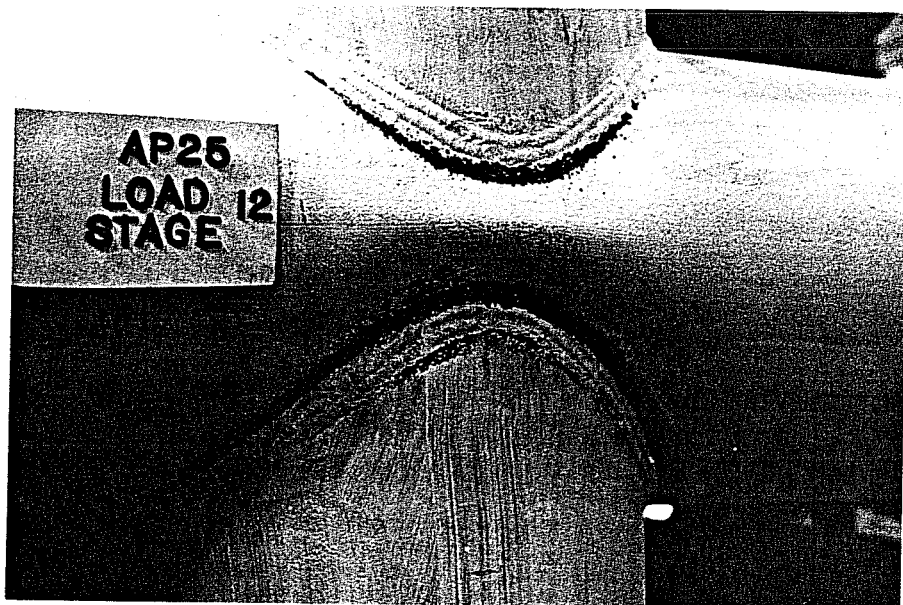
Typical Compression Failure by Buckling of Chord Wall
